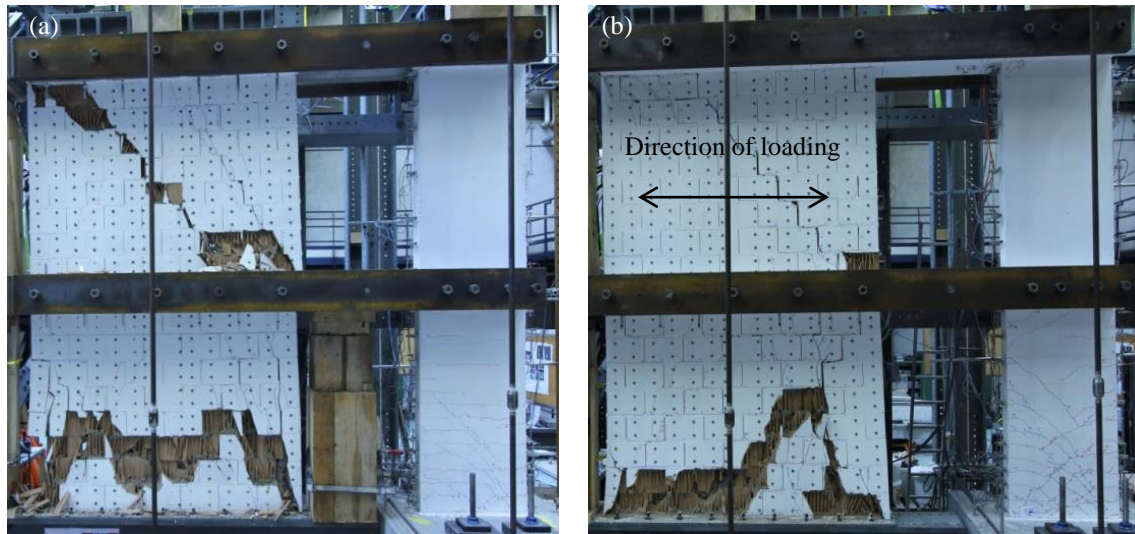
EPFL tests on two mixed RC-URM wall substructures: crack pattern after failure. (a): TU1. (b): TU2 [Paparo and Beyer, 2014].
